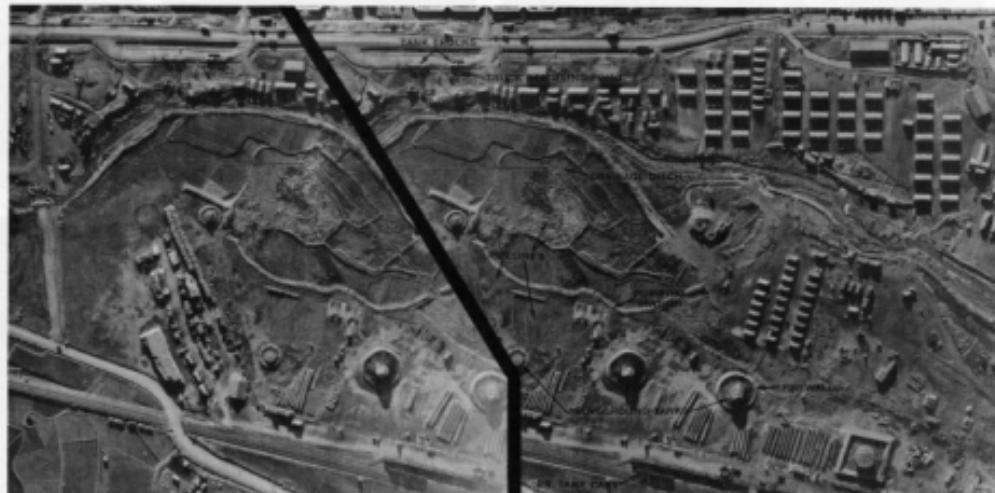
Aboveground tank storage system in South Korea. Tanks camouflaged with netting.
